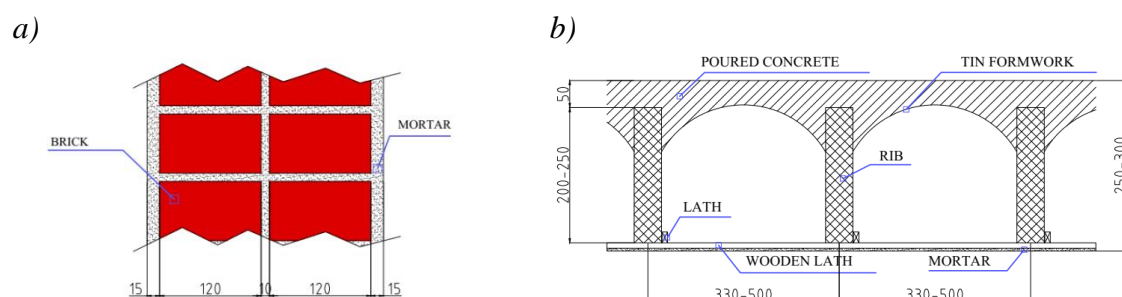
The appearance of the cross-section: a) of the outer walls; b) interconnected structures
